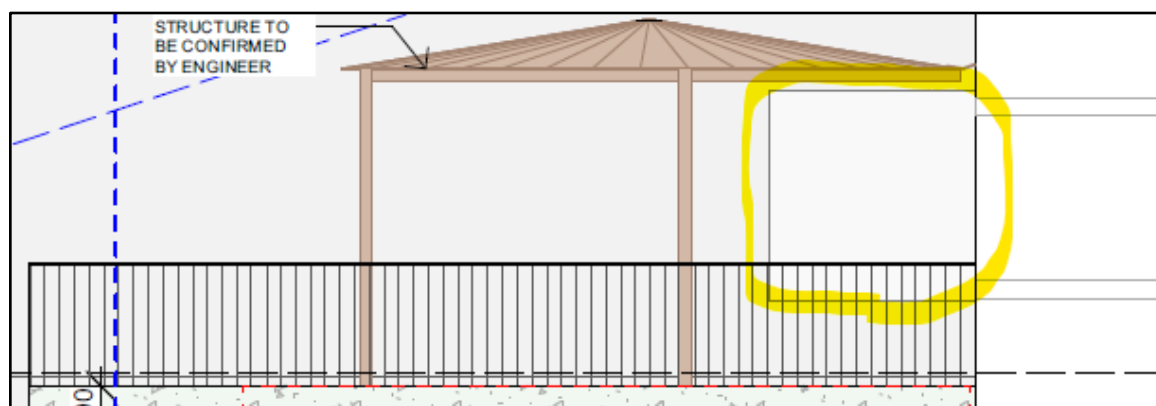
Extract of north side elevation highlighting the window view which is recommended to be screened.
